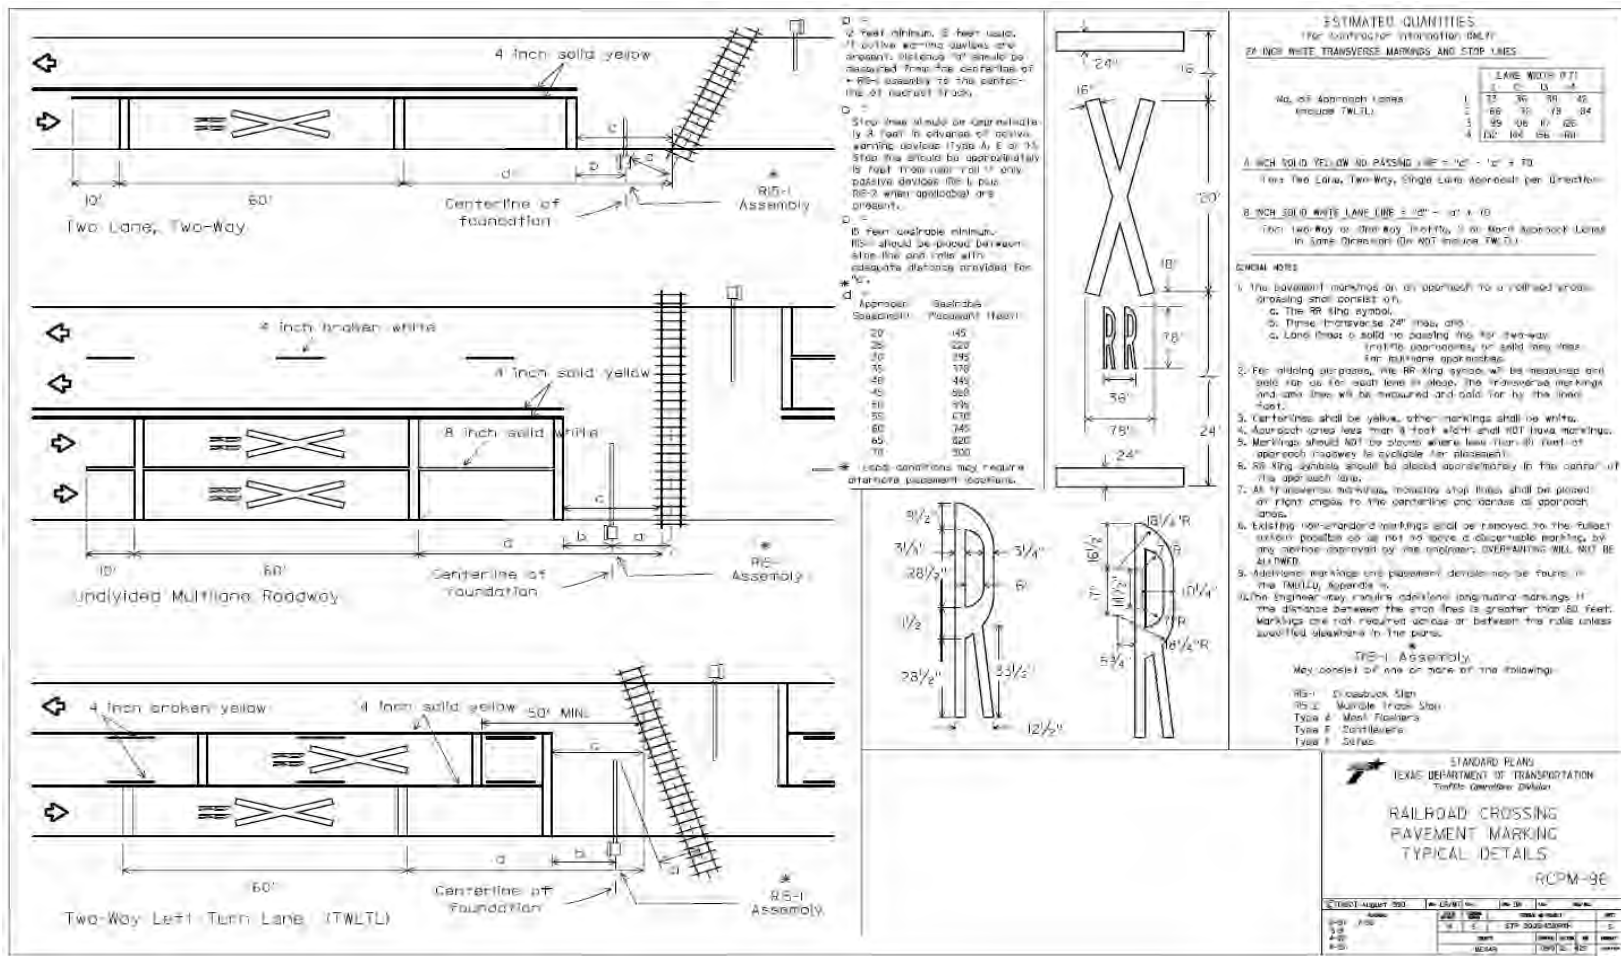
Alternative pavement markings at highway-rail grade crossings.
